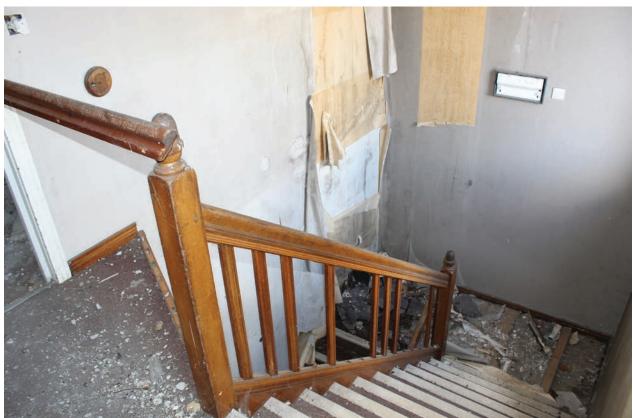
View of staircase with original balustrade, facing south-west. No scale
